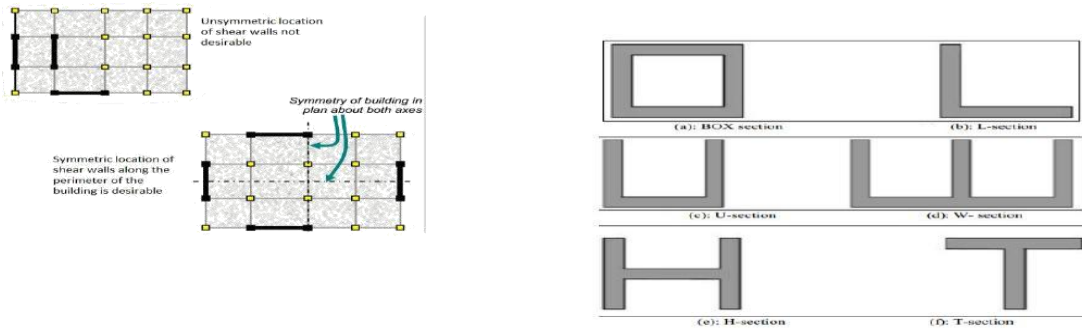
Shear wall plan layout (adapted from earthquake tips)
